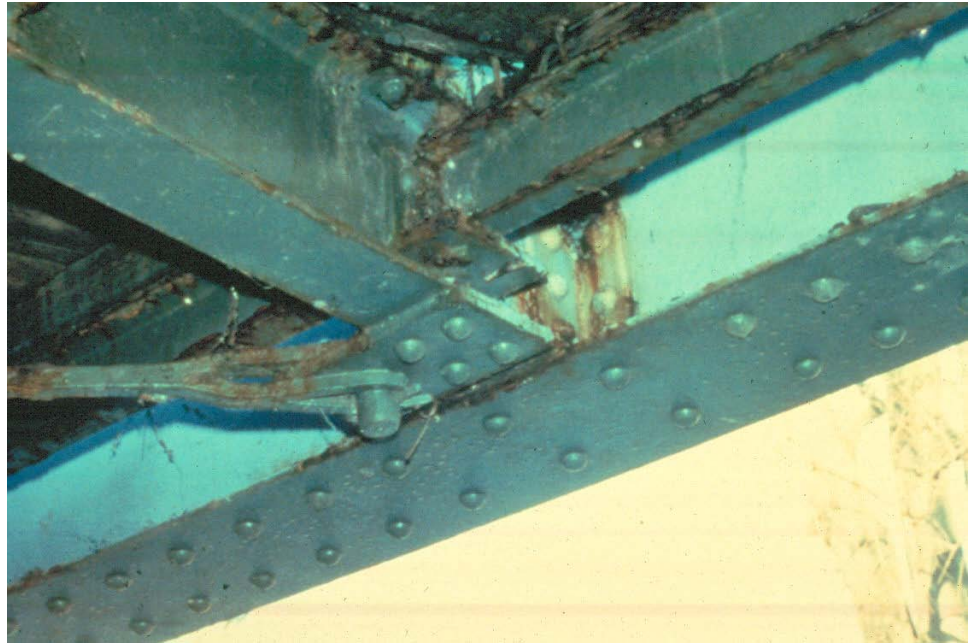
Lateral Bracing Connection on a Through Girder Bridge
